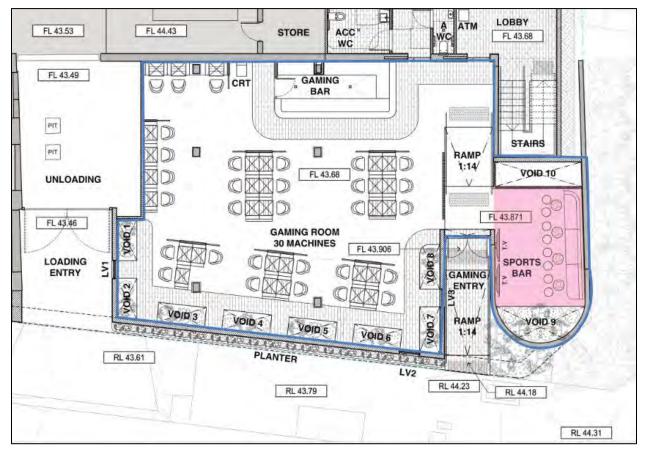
Areas with additional capacity restrictions (Source: Design Collaborative/Paul Kelly Design)
